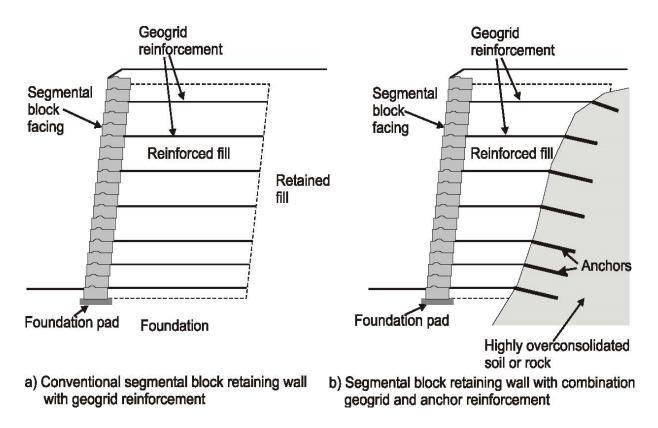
Conventional geogrid reinforced segmental block wall and one with a combination of geogrid and anchor reinforcements
